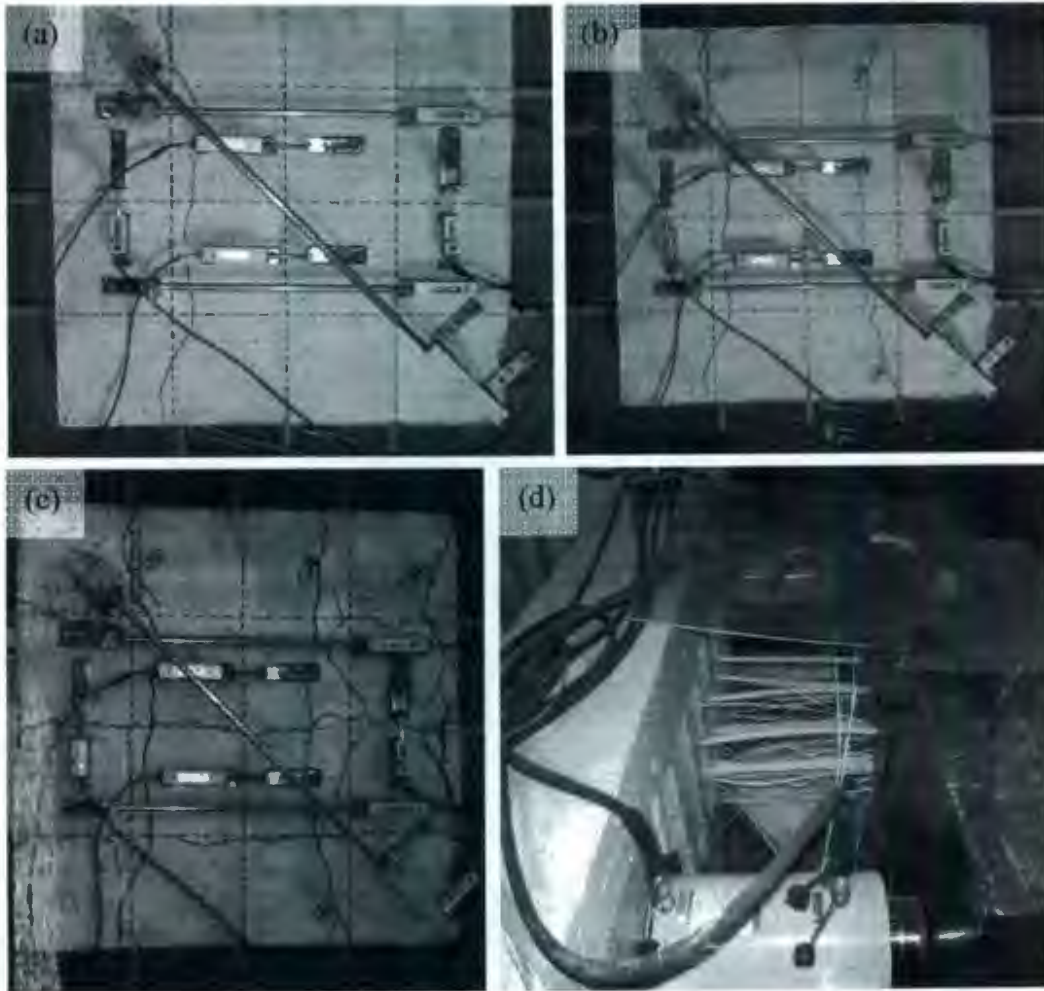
Typical stages of failure for panel P1-GNU-16-1.0-1.5
